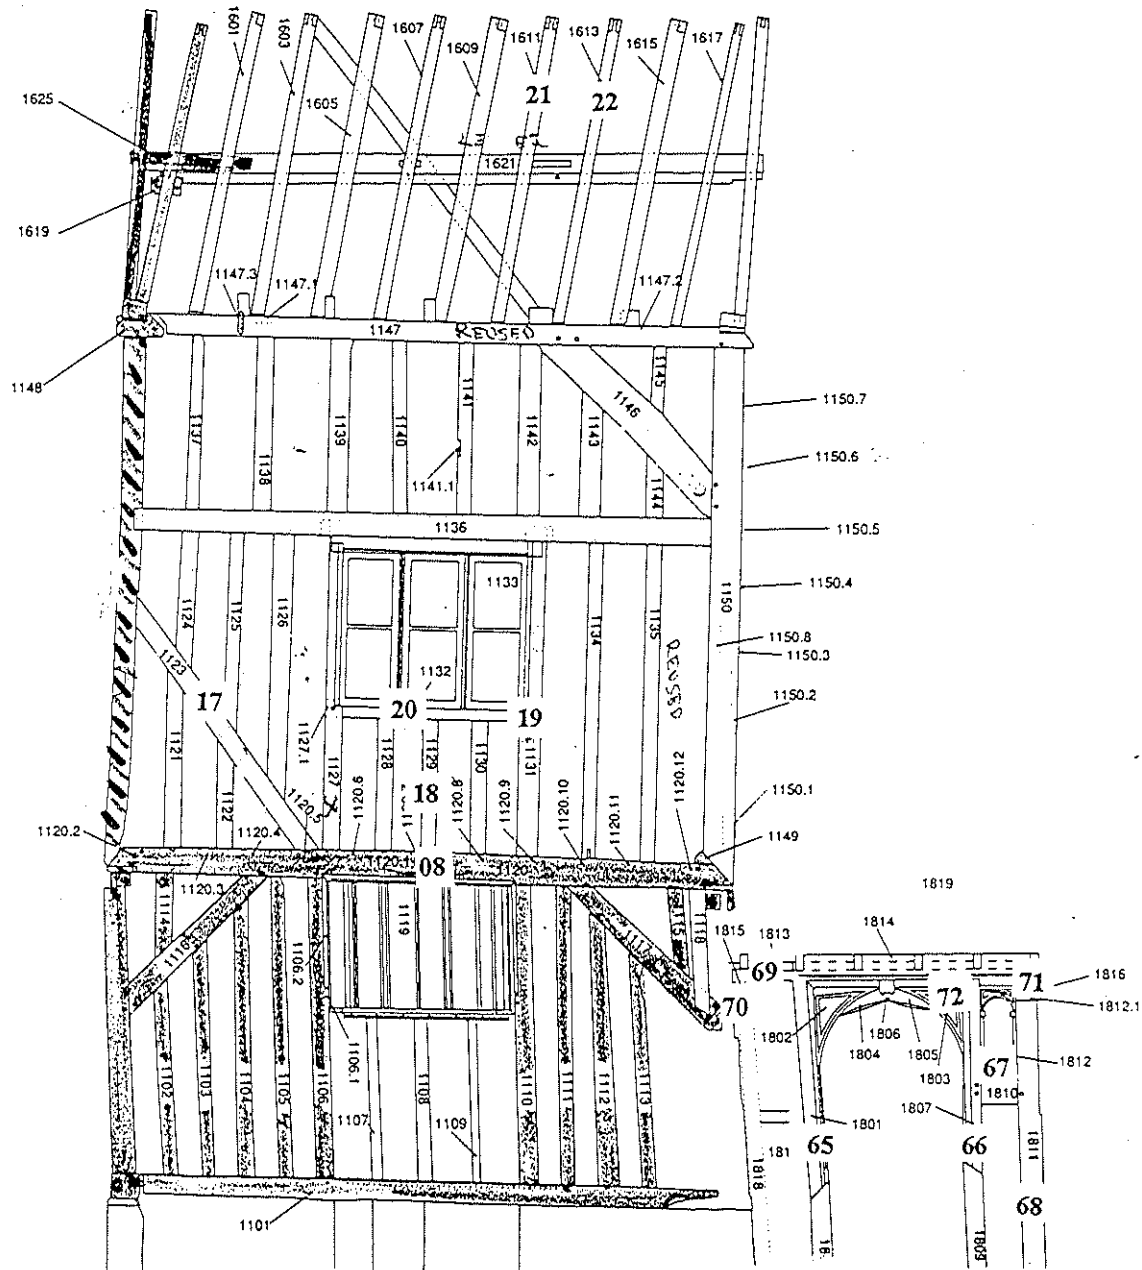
West elevation of the roof of the tower (viewed from the east)
